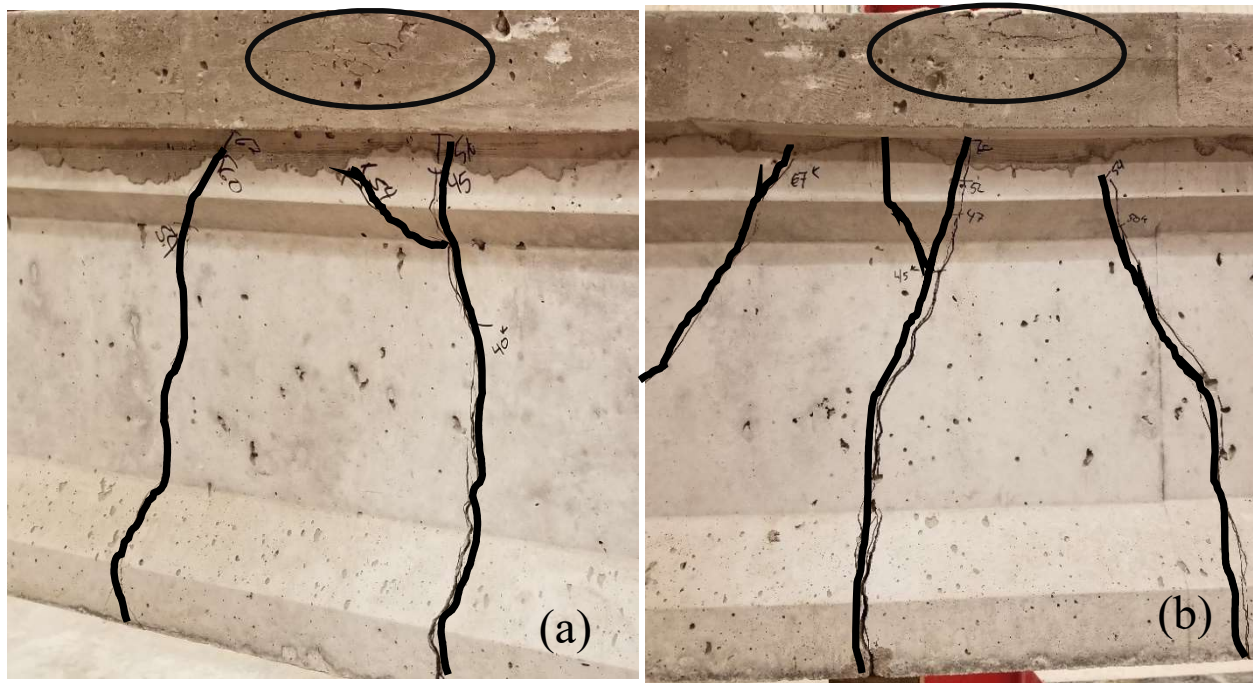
Crushed concrete deck in the NC2-N (a) and NC2-S (b) girders is indicated by a black oval, and the final flexural cracking under the load point in the girders are indicated by dark lines.
